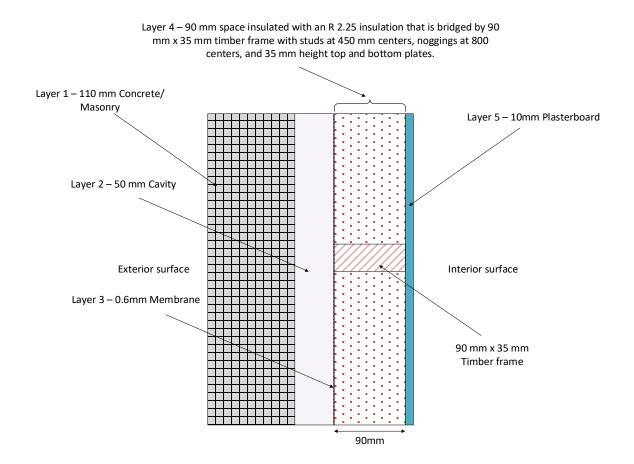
WALL BUILD UP FOR BRICK VENEER TIMBER FRAME
